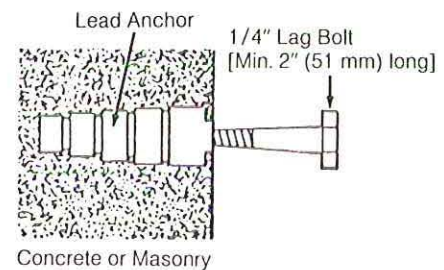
Mounting on Concrete, Concrete Block or Masonry Wall
